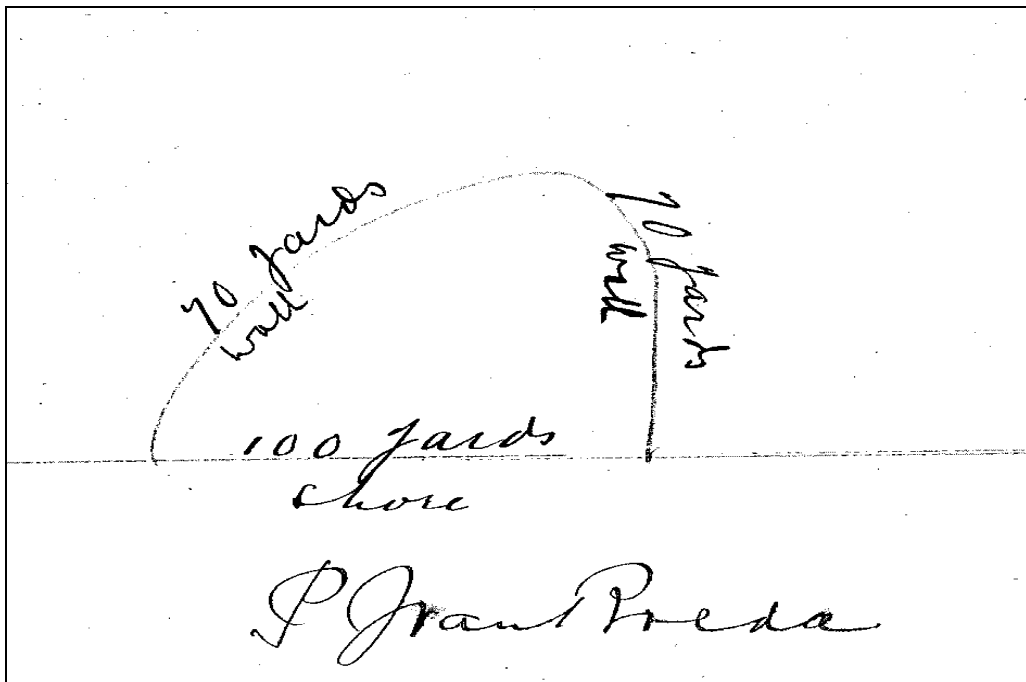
Plan of Fish trap of P. J. van Breda at Stuis Bay. Cape Archives. PAN 55. K13/13.
